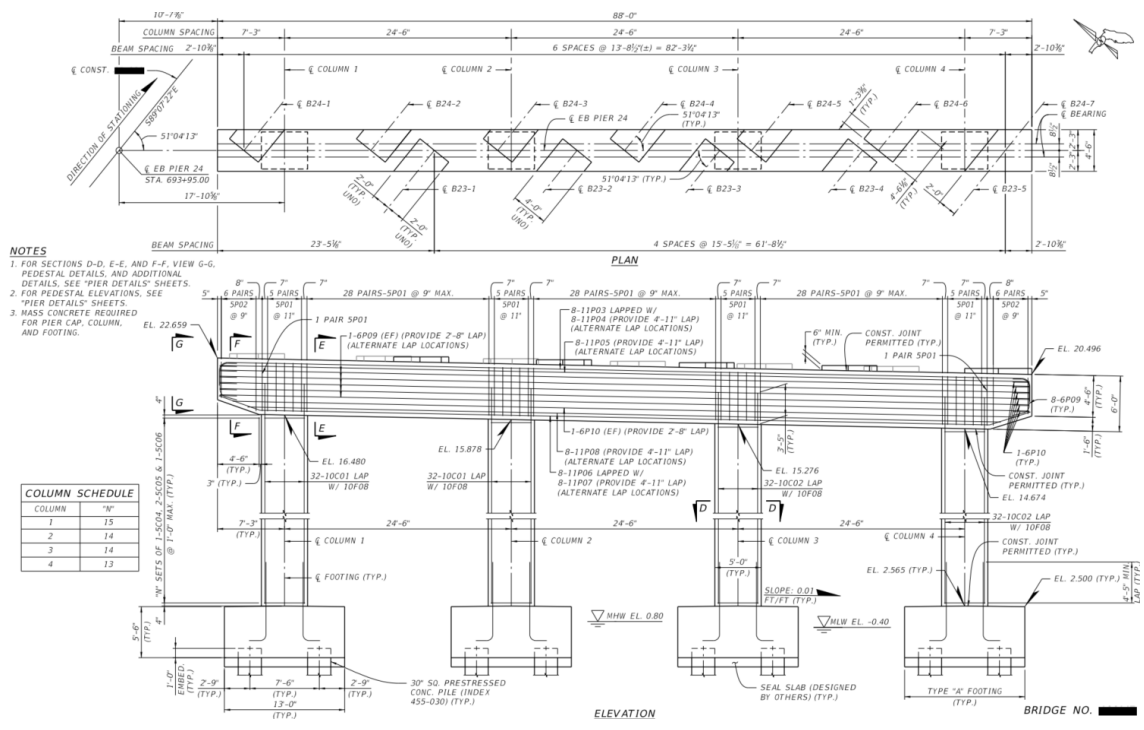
Carbon-steel reinforcement layout – Pier cap of the selected Pier n.24 of the Eastbound Bridge (B1-111)
